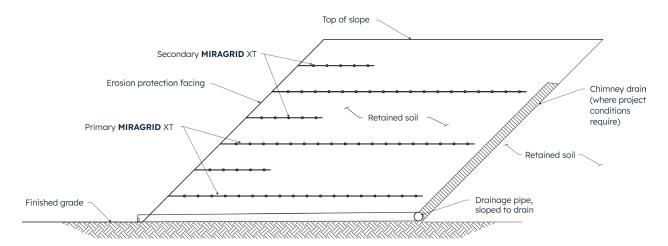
Typical Reinforced Soil Slope (RSS) cross section
